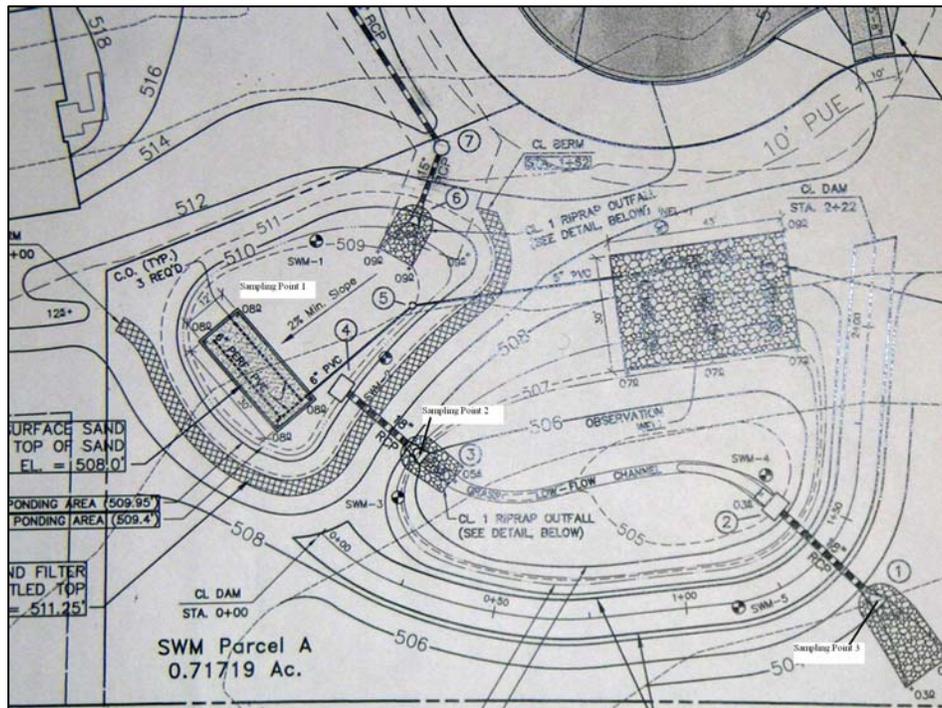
Plan view of Snider's Estates SWM with marked sampling locations (Jones & Schreiner 2008). The plan illustrates during construction / pre-conversion sampling points (3) and the discussed post-construction flow monitoring station (Sampling Point 2).
